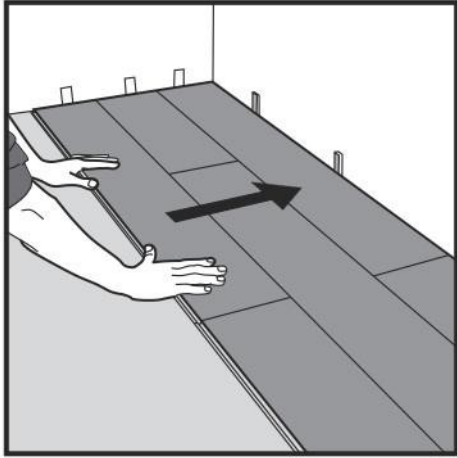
After 2-3 rows, adjust the distance to the front wall and side walls to keep the gaps at 5/16" (8mm). Install the remaining flooring. Spacers should be removed once the installation is completed.
